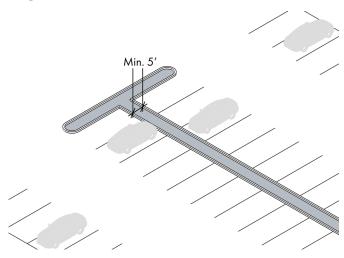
Raised planting areas shall be used to separate double-loaded parking areas.
